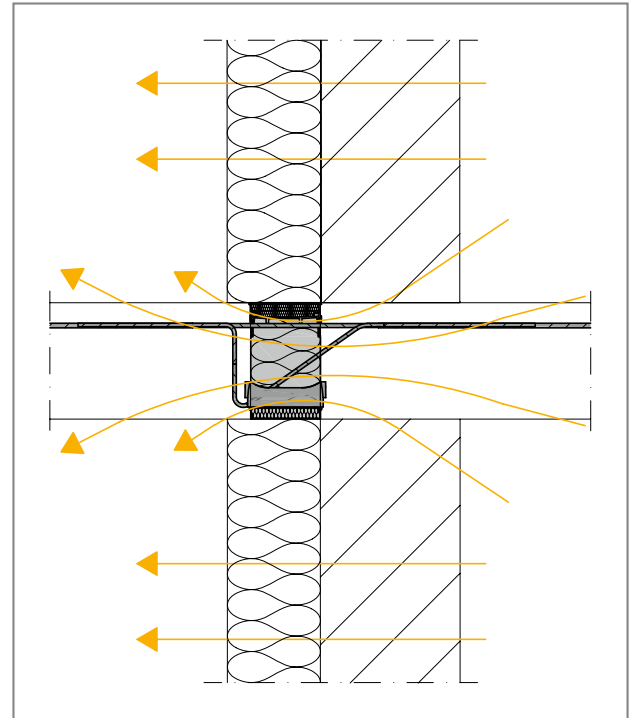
Minimal thermal loss for balconies or passageway walks with a load bearing thermal break element
